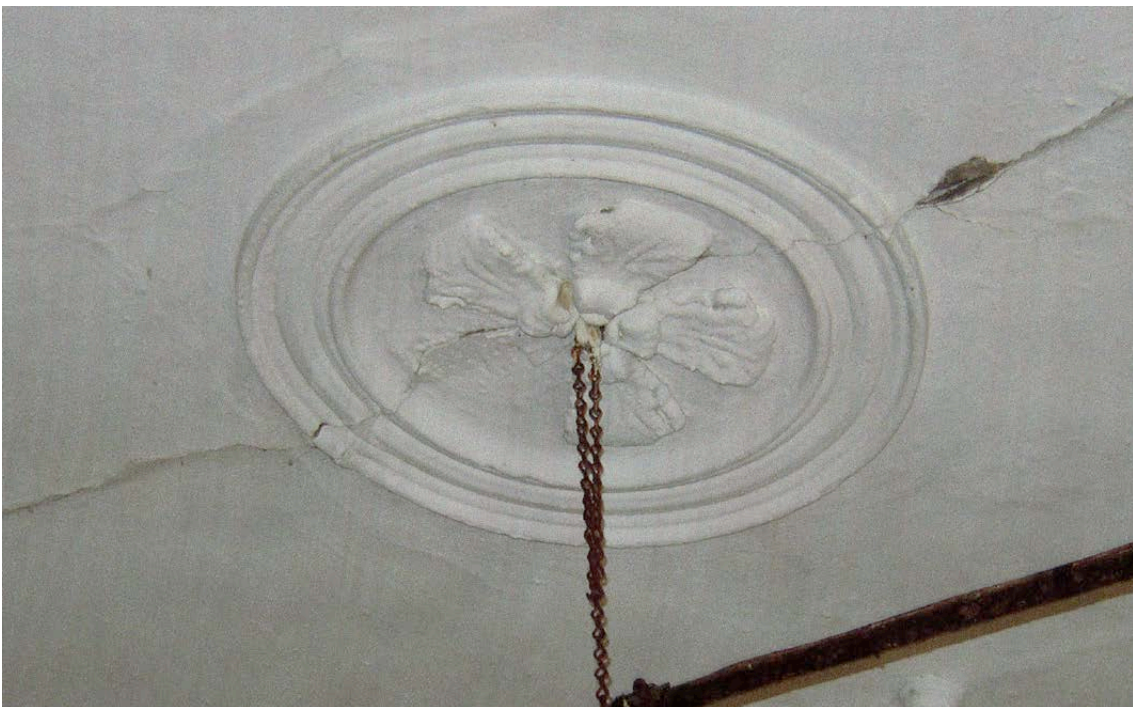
Detail of ceiling rose (photo by Betterment Properties (Weymouth) Ltd)
